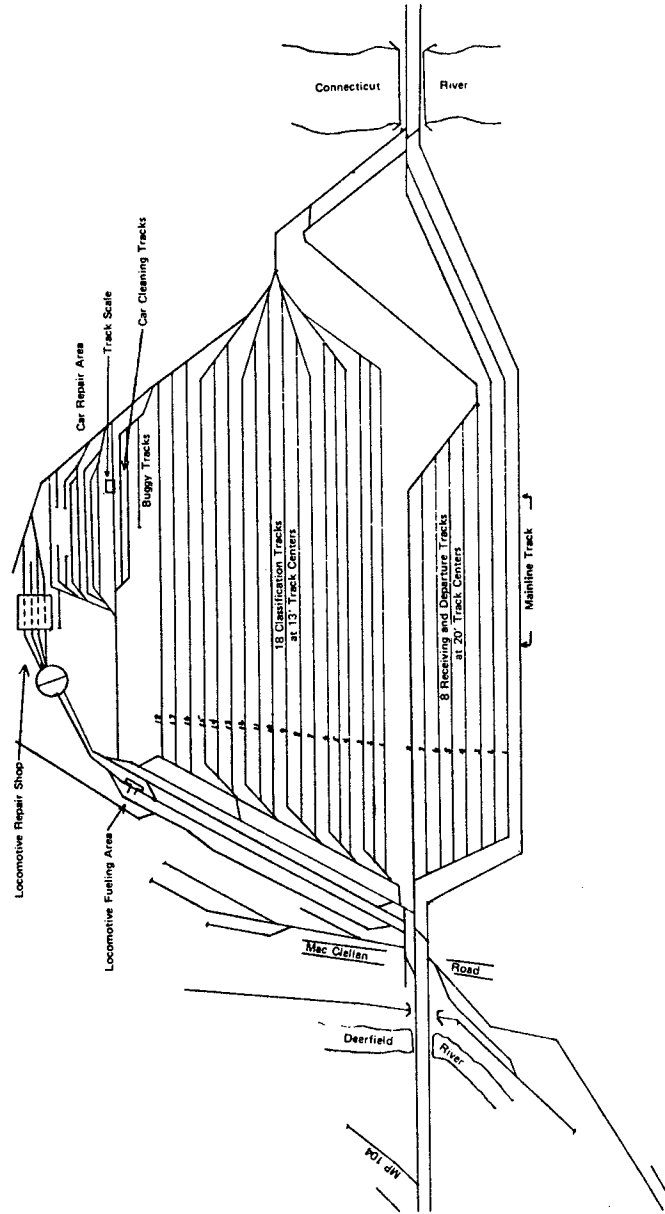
PROPOSED SCHEMATIC LAYOUT OF EAST DEERFIELD YARD
